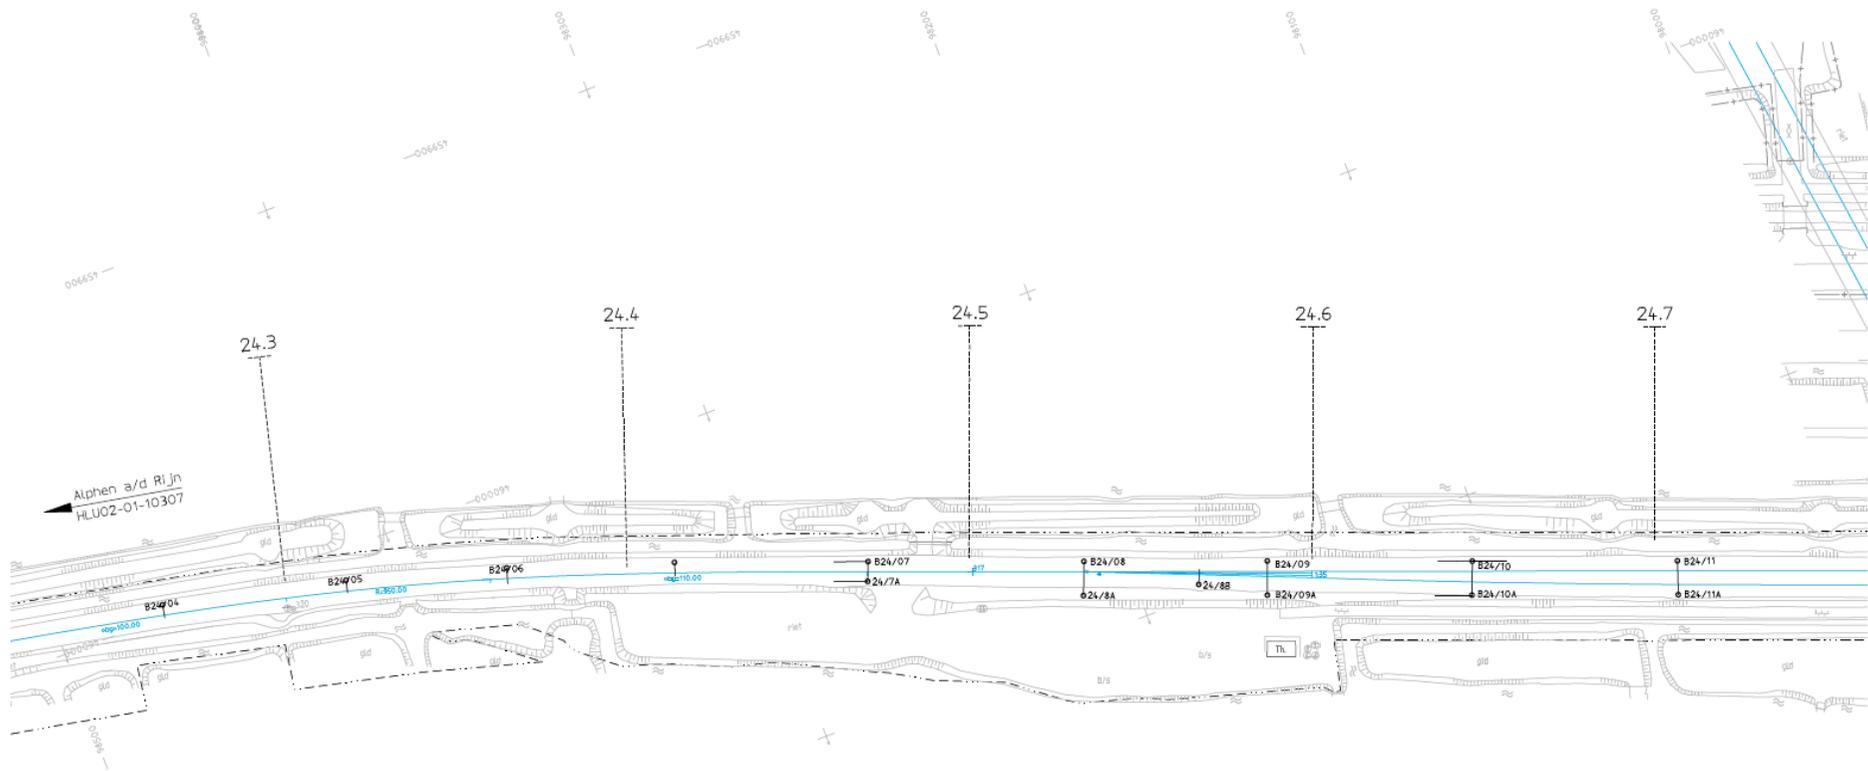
Top View Railway Embankment between km 24.3 – 24.7 (Arcadis, 2016)
